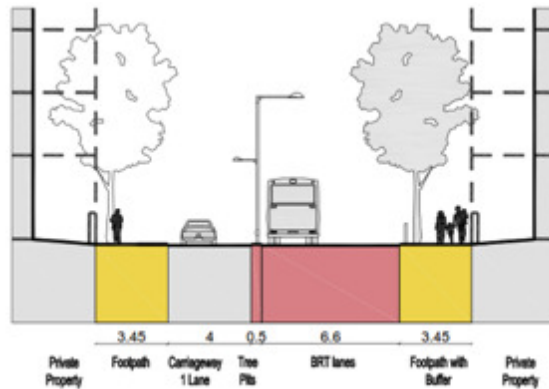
Rajendra Chowk to Doranda High Court: 18 m BRT corridor cross section with two way BRT lanes and one way mixed traffic lane.
